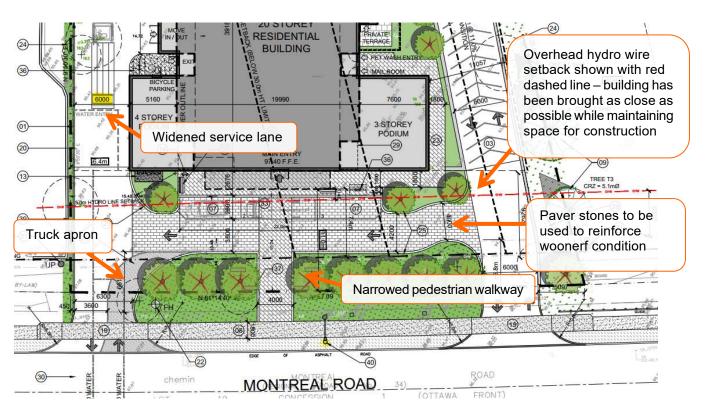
Revised Site Plan showing the changes made to date on the ground floor (Site Plan prepared by RLA Architecture)
